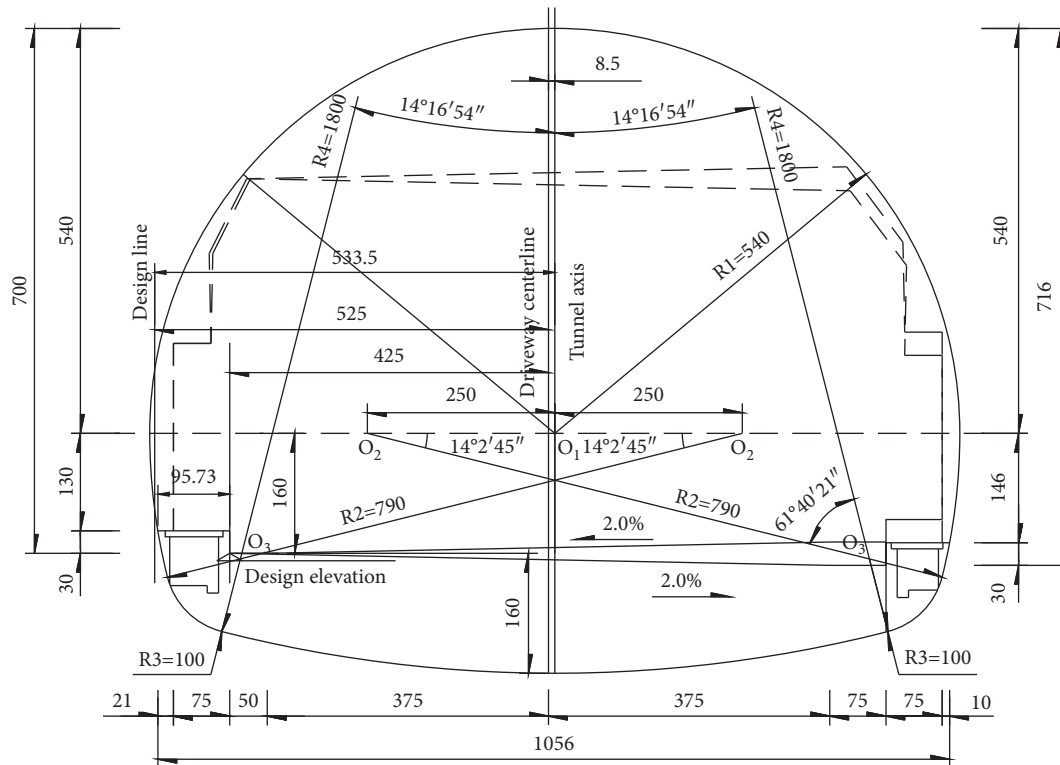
Interior outline design of the Dugongling tunnel (unit: cm).
